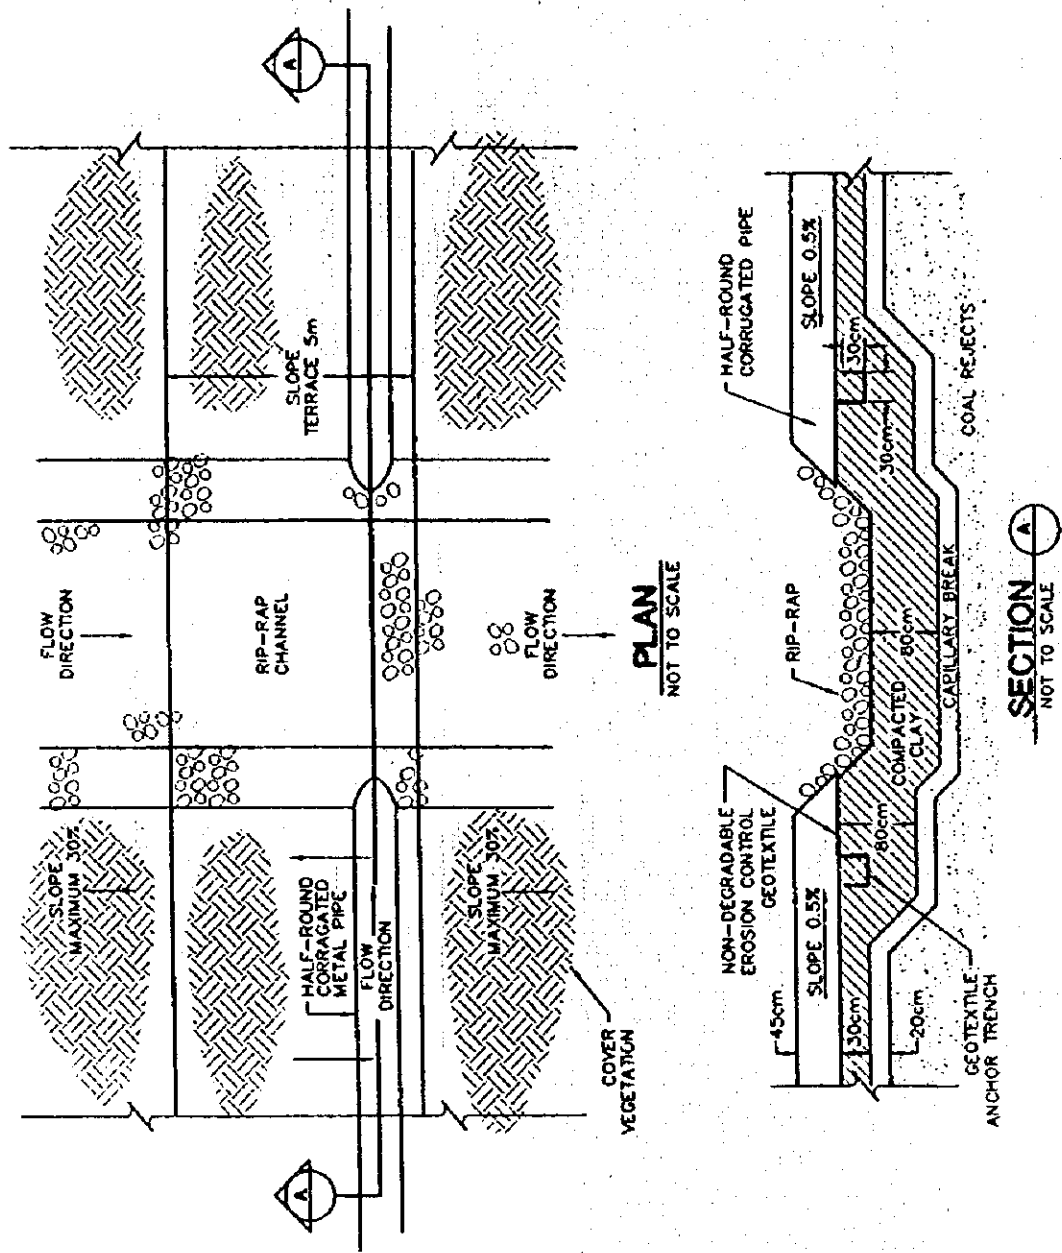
SURFACE DRAINAGE DESIGN DETAILS
